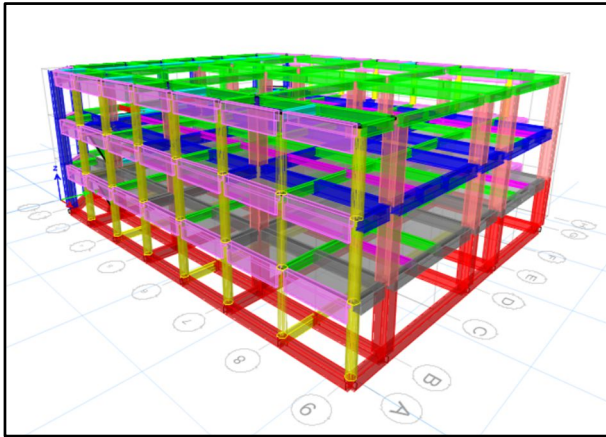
3D structural model of laboratory building zone A and B (model 1)
